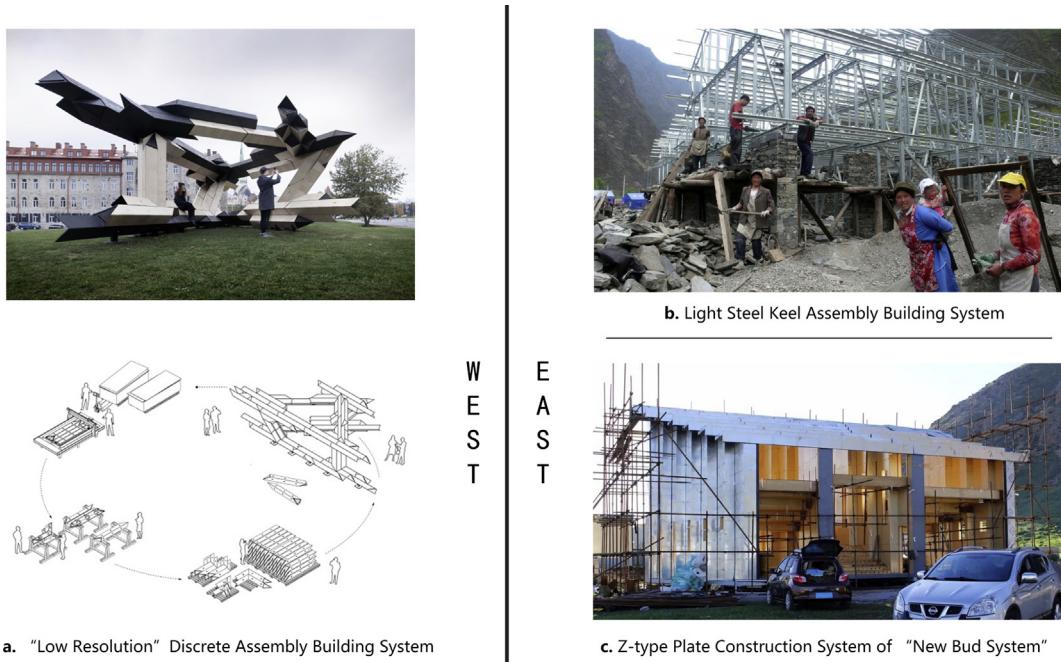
(a) Gilles Retsin Architects, Tallinn Architecture Biennale Pavilion, 2017; (b) Xie Yingjun Architects, Yangliu Village Reconstruction Project after Wenchuan Earthquake, 2008; (c) Zhu Jingxiang, the new Raouga Primary School in Yushu, 2015. Source: (a) Gilles Retsin Architects website. (b) Related website news reports. (c) Zhulong BBS.
